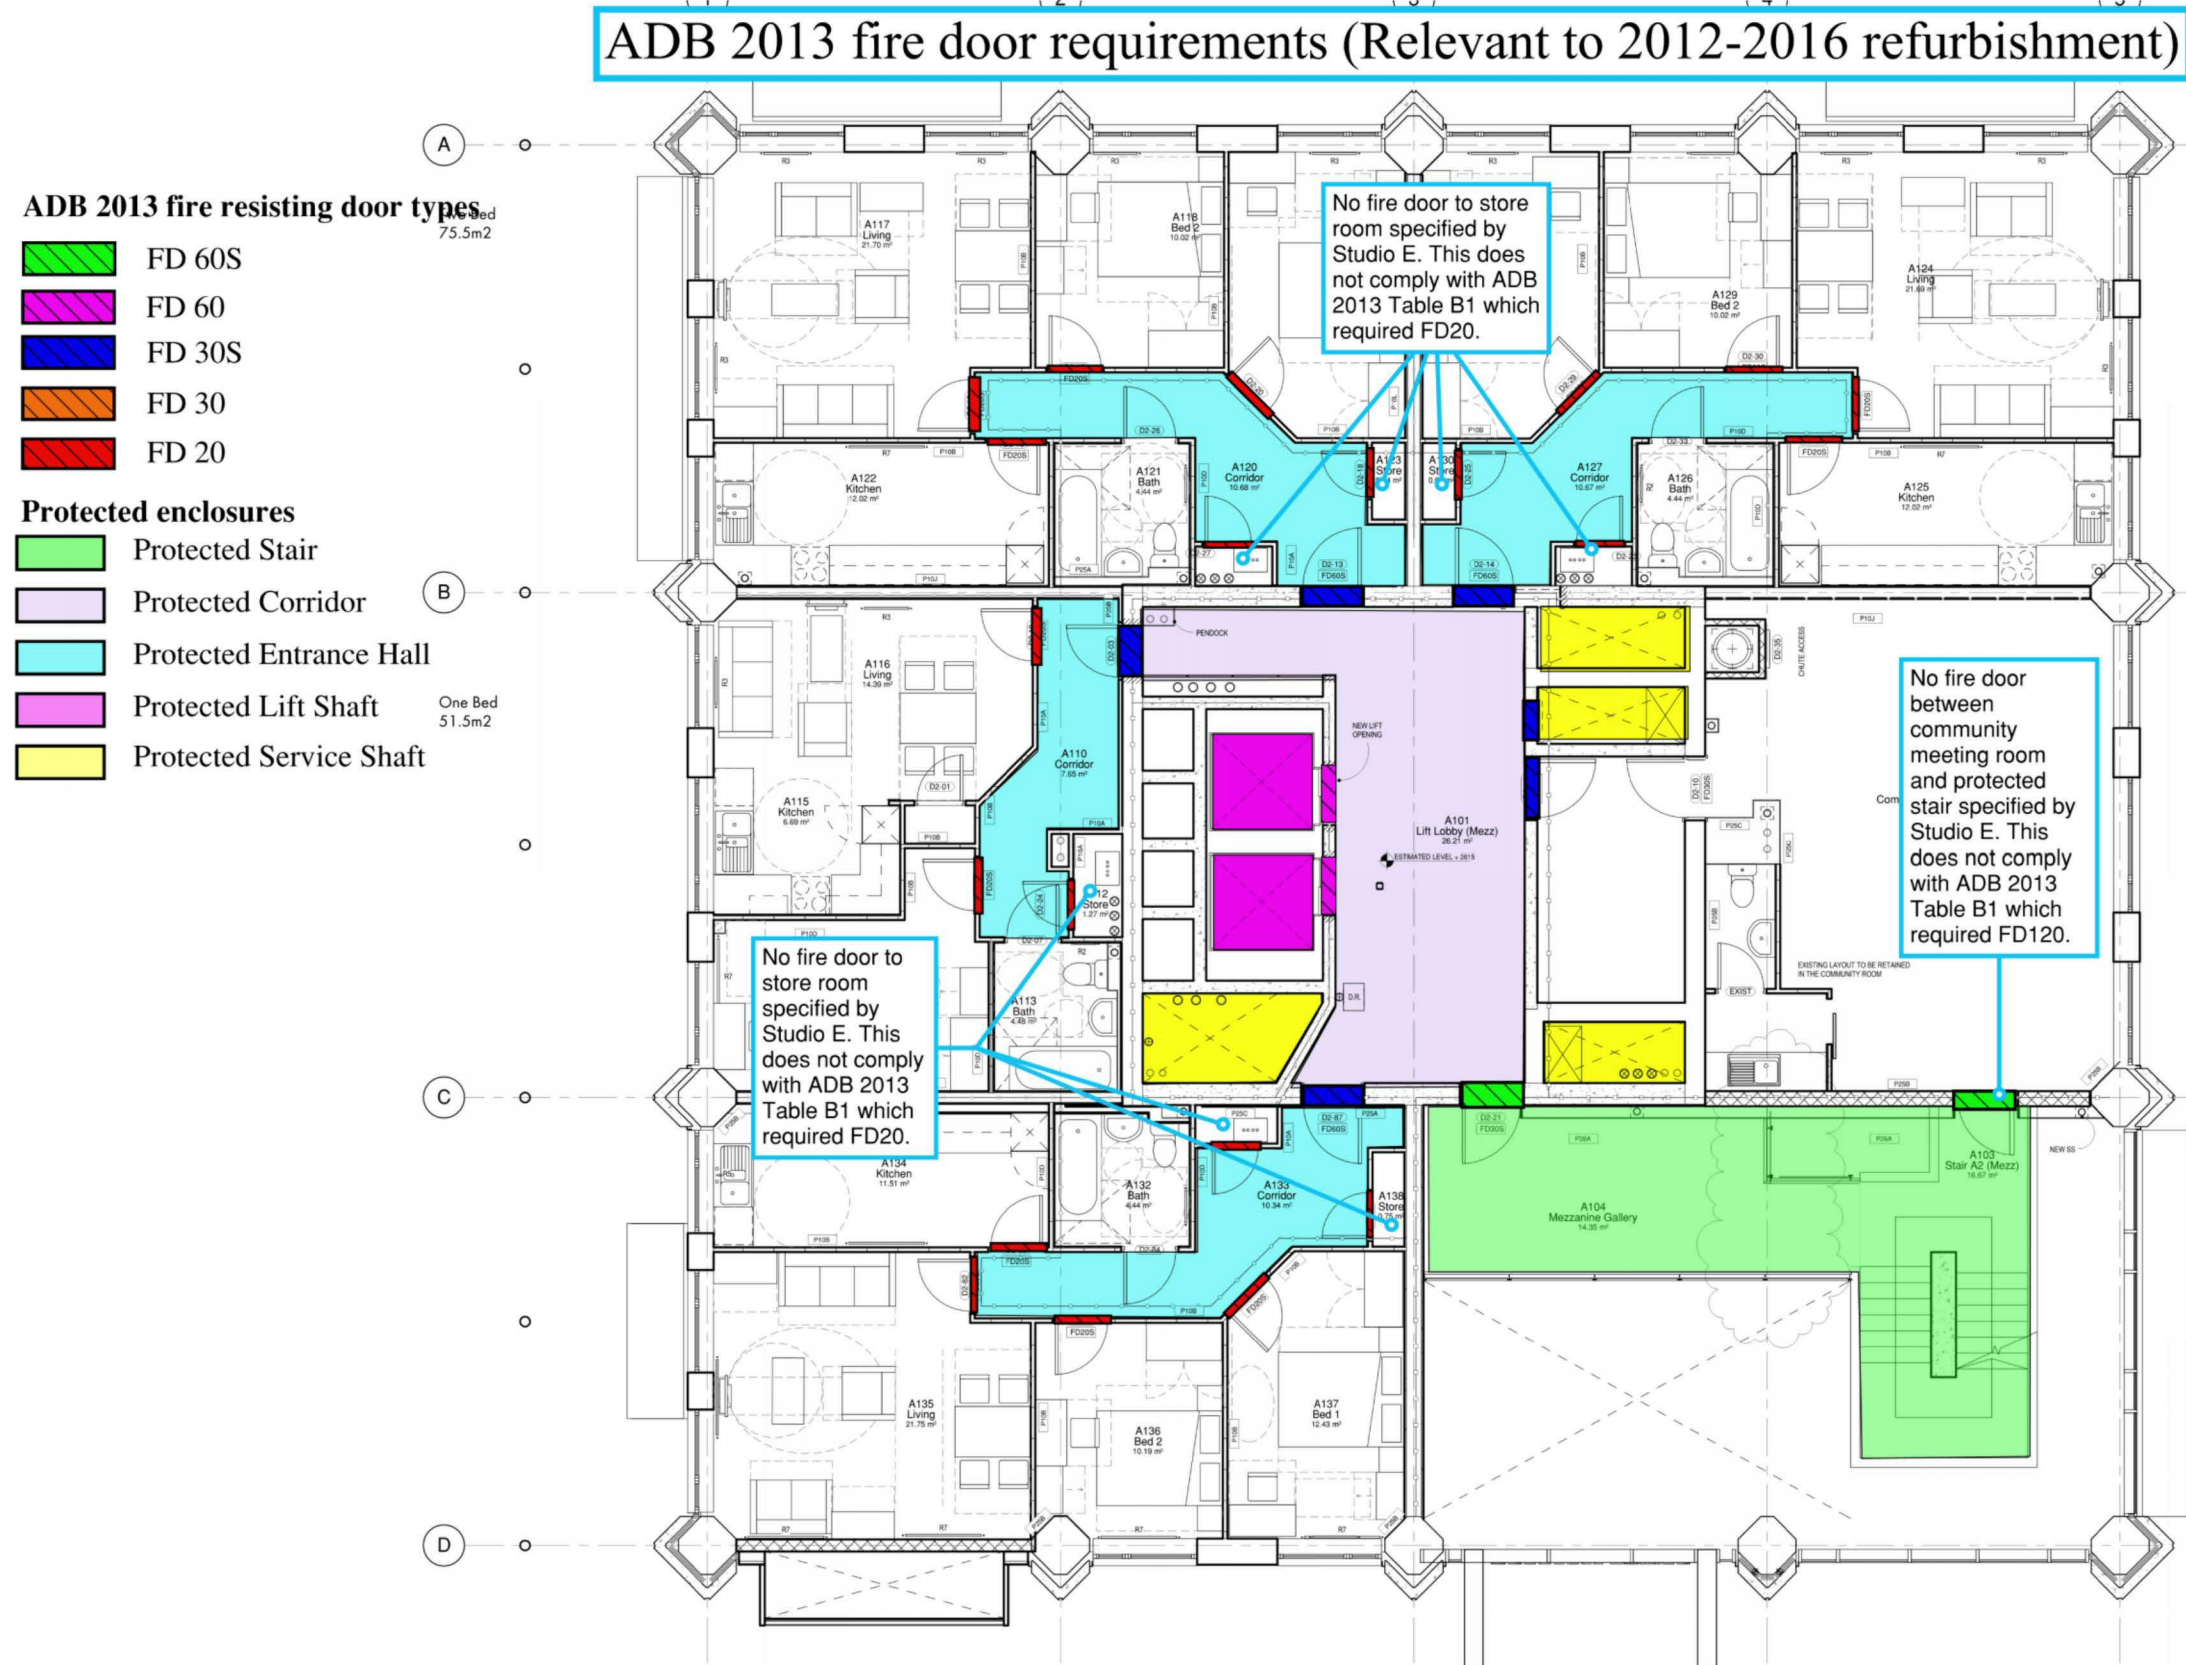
Indicative over marking of ADB 2013 compliant fire doors on the Studio E as built level 1 floor plan (SEA00003231)
